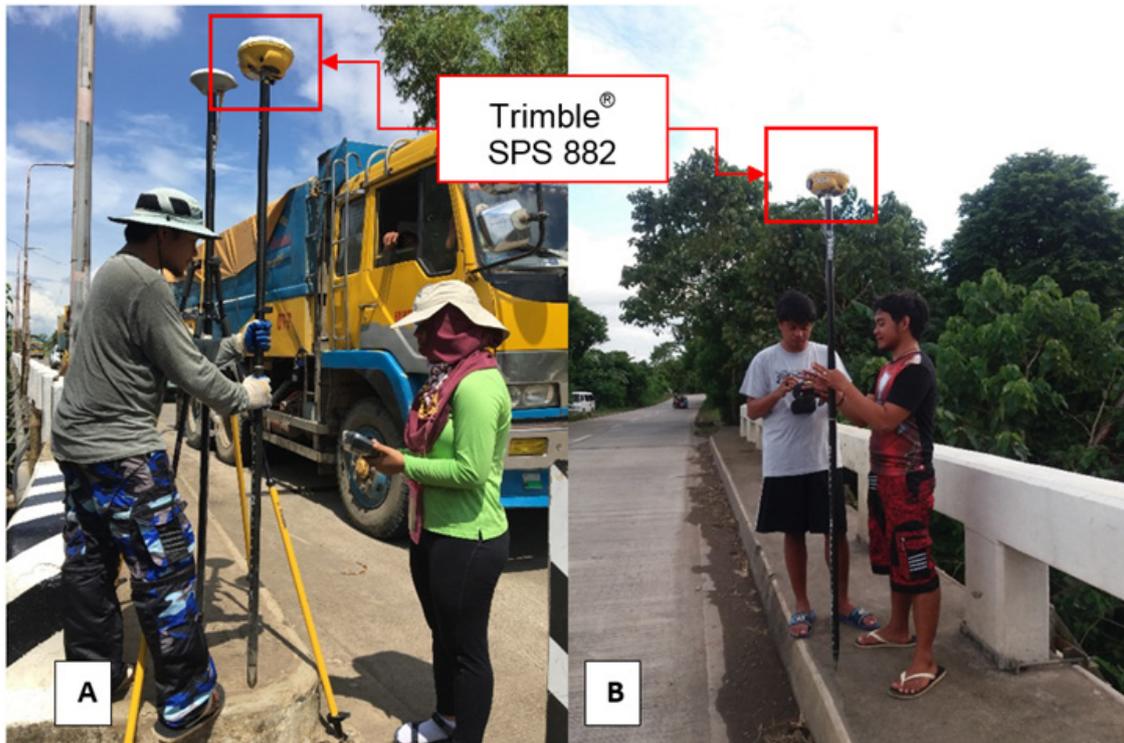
As-built survey of (a) Quezon Bridge and (b) Maragandang Bridge
